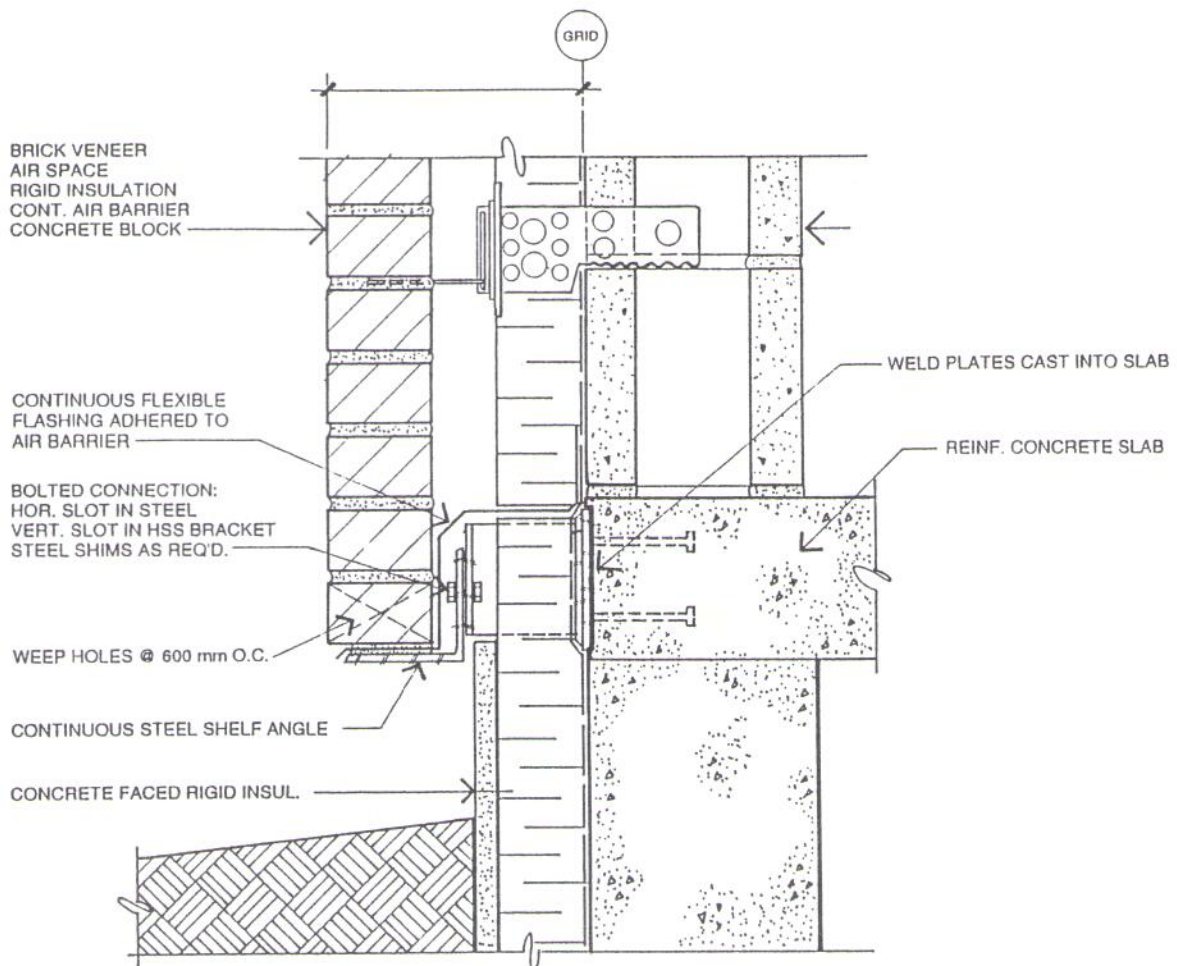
Brick Veneer/Concrete Block Detail At Foundation
